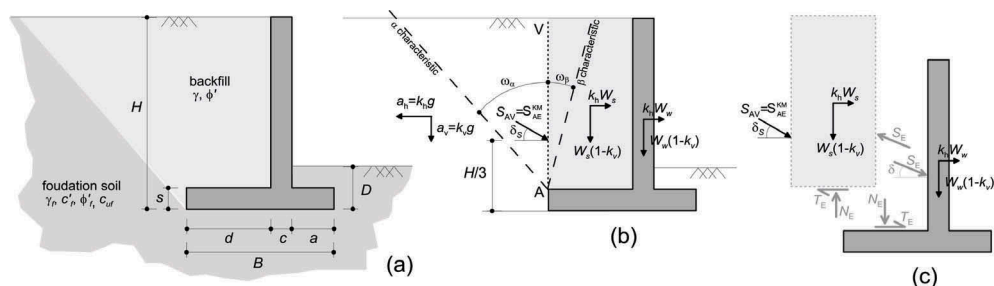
Cantilever walls: (a) typical layout; (b) system of pseudostatic external forces; (c) assessment of the internal stability.
